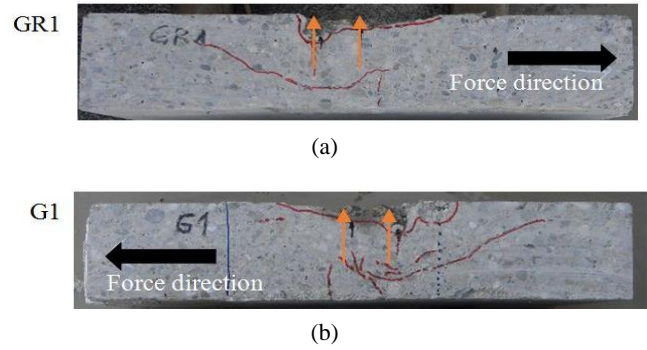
Concrete slab longitudinally sliced through the middle of the group of studs (G1&GR1)
